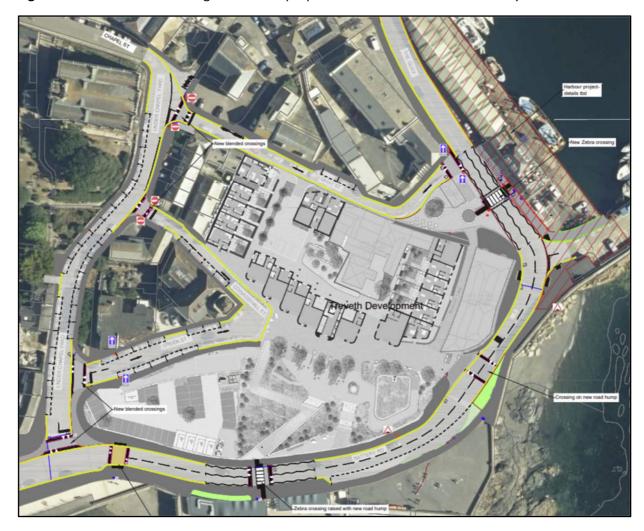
Coinagehall Street Improvements (Source: Penzance Town Fund)
